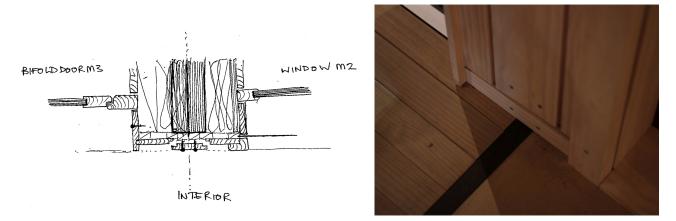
(left) Plan detail for both the door architrave and the window architrave and the constructed detail (right)
